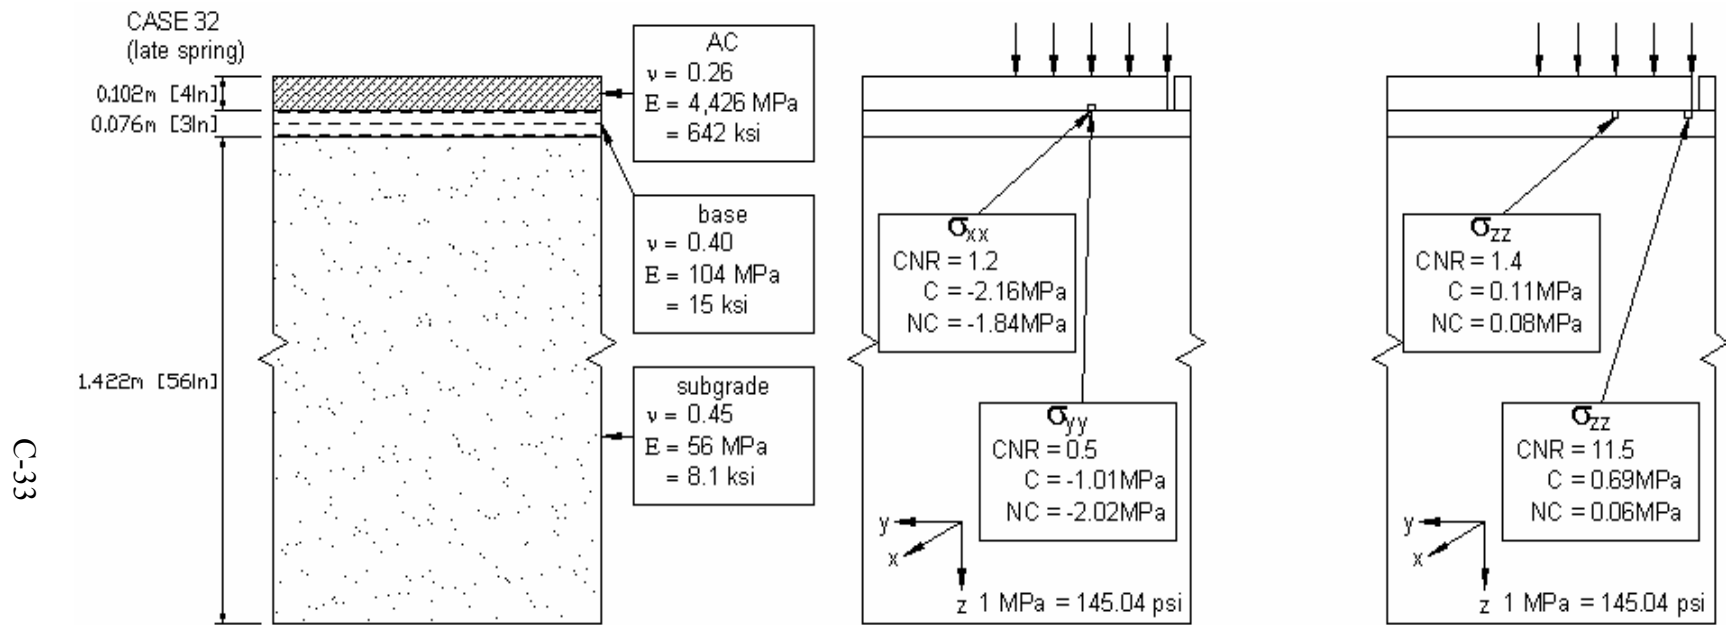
Summary cross section for case 32, (C – stress in cracked pavement, NC – stress in pavement with no crack, CNR – crack/no crack (stress) ratio)
